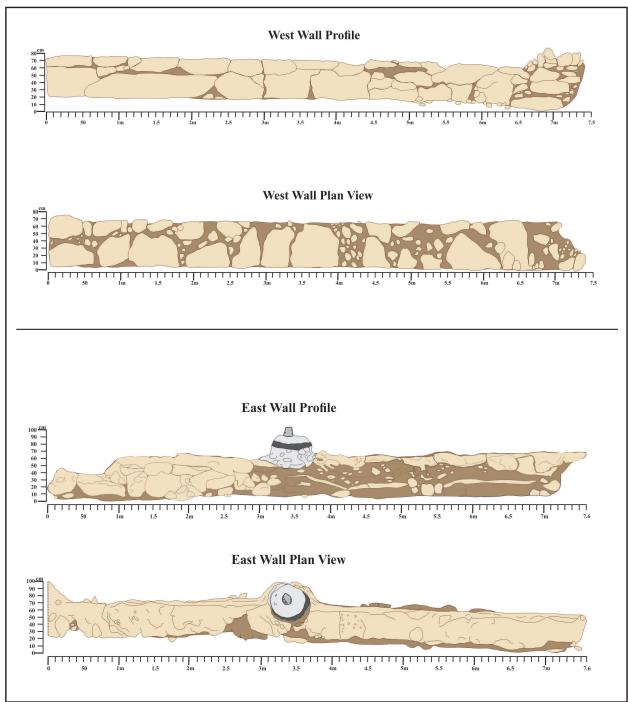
Area A, Acequia Madre de Valero (41BX8), wall profiles and plan views.
